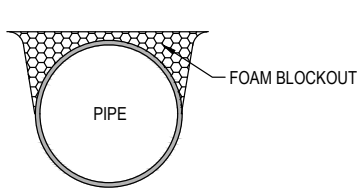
G: EXCAVATE AROUND MAIN & ATTACH BLOCKOUT
